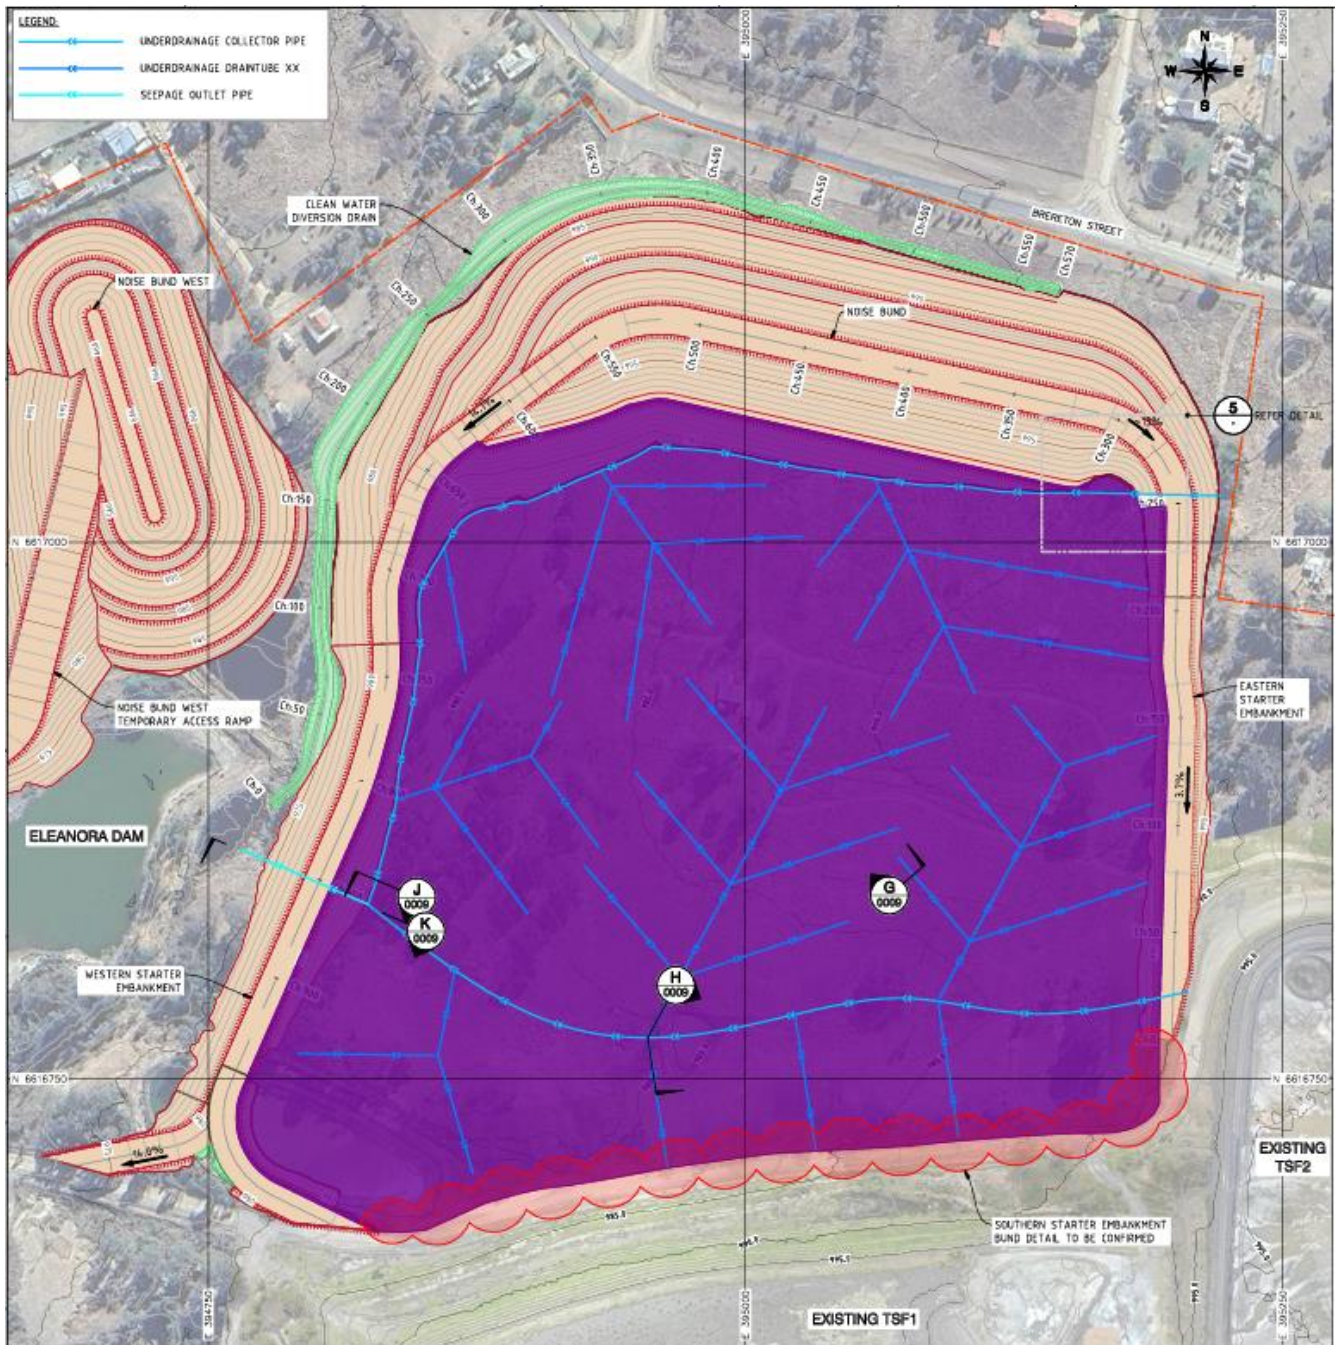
Dewatered Tailings Landform – Liner and underdrainage
